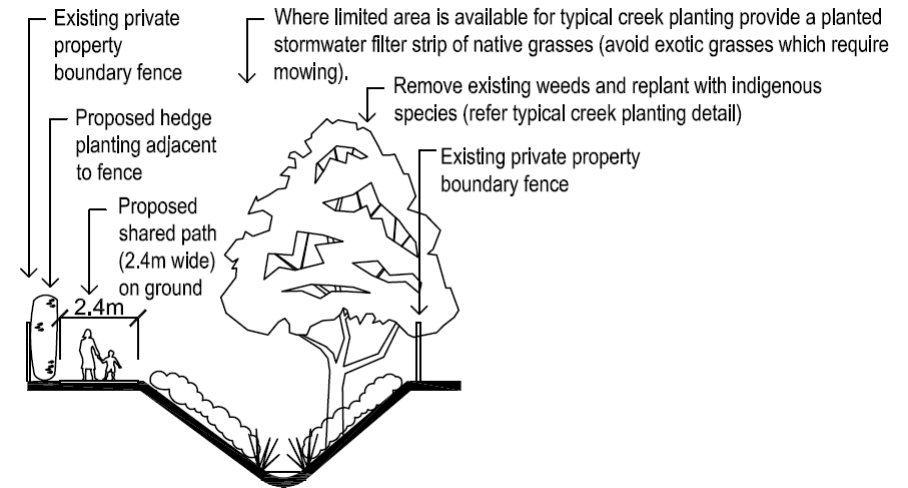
Typical treatment – narrow creek corridor (with level bench)
